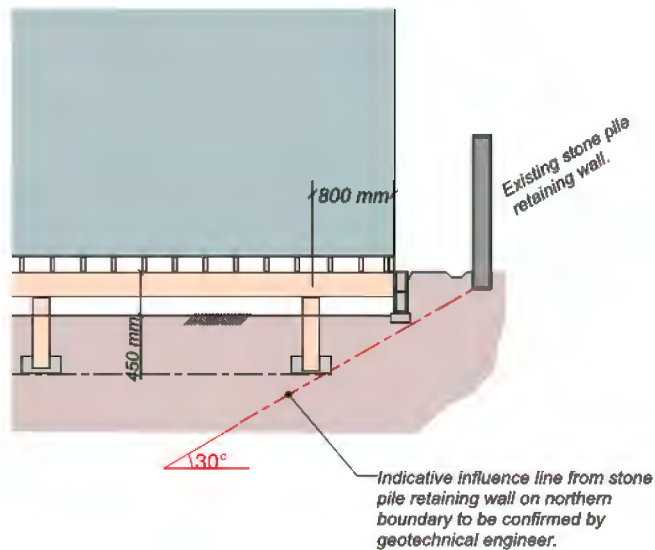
Sketch indicating footings to be founded below the stone pile retaining wall's 'zone of influence'.
